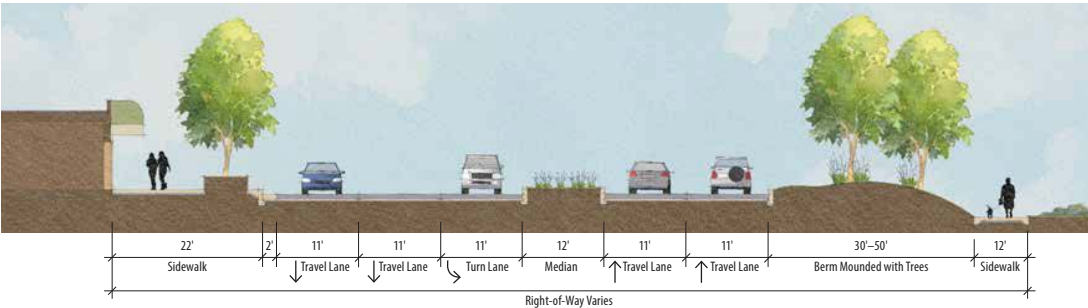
BASS LAKE ROAD EXISTING STREET SECTION Dated streetscapes and disconnected park sidewalk contribute to a pedestrian-unfriendly street.
